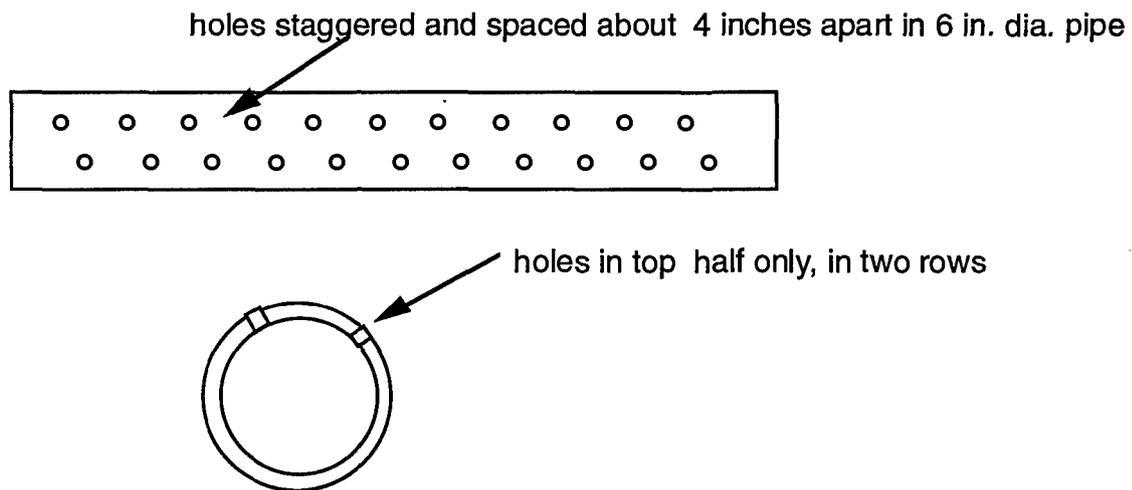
Perforation geometry. Holes are to be of about 0.25 in. diameter with minimum sharp projection on the inside.
